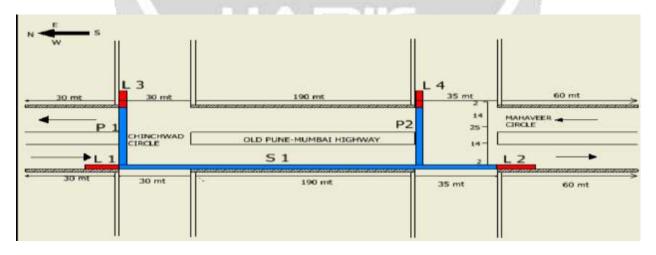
Proposed Sky walk plan at old Pune Mumbai highway:
